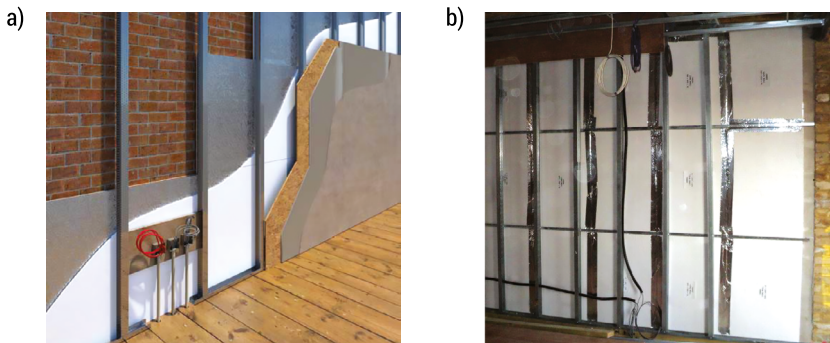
Internal wall insulation: (a) – wall layers, (b) – fixing an L-shaped metal section (Source: KEVOTHERMAL case study 022, 2015)
